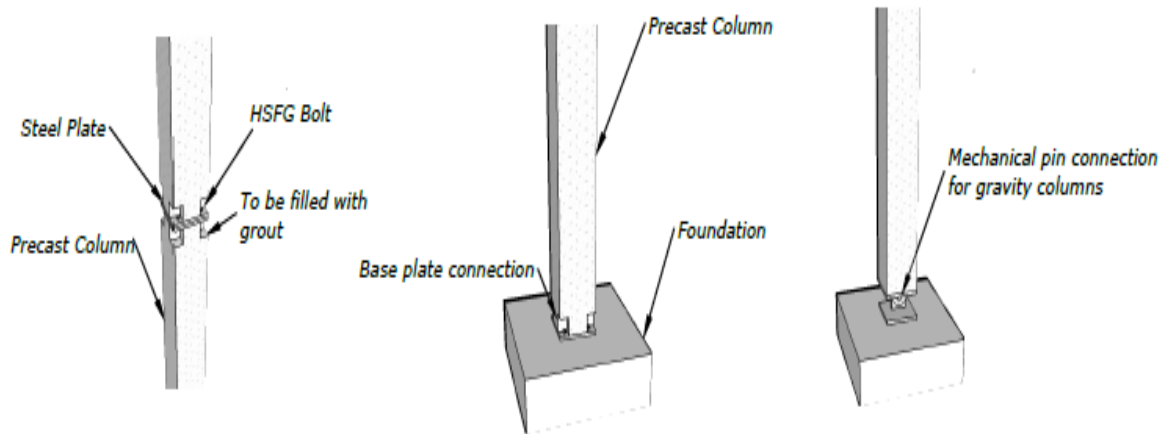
Column-column connection, column-foundation connection using steel end plate and bolts
